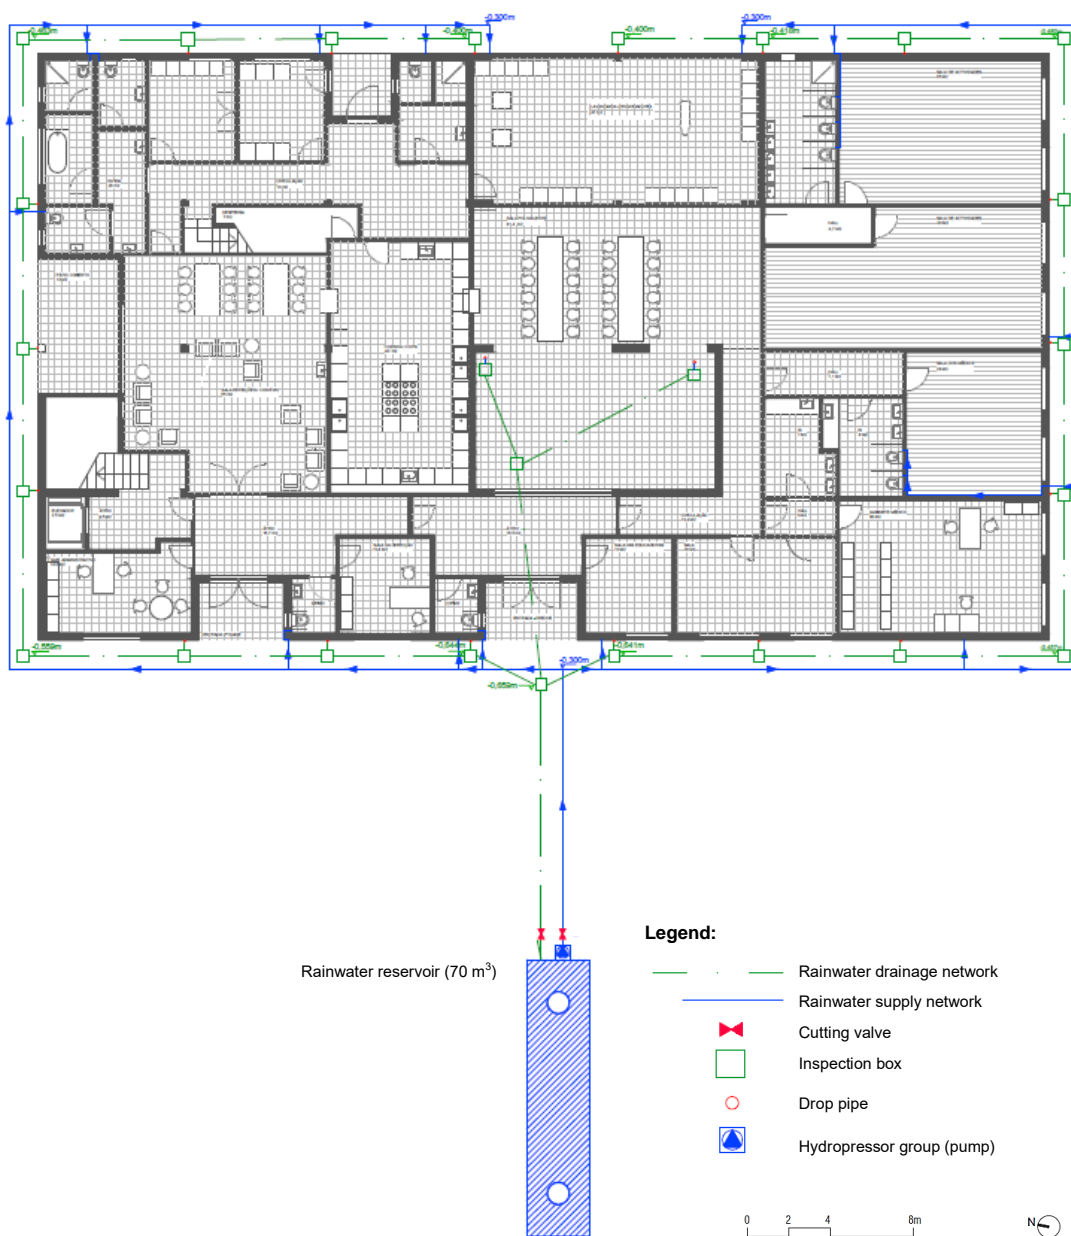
Rainwater drainage network and rainwater supply network (1st floor) [7]
